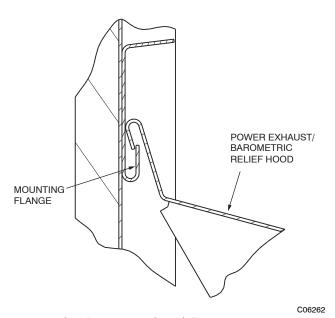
Barometric Relief/Power Exhaust Hood Flange
